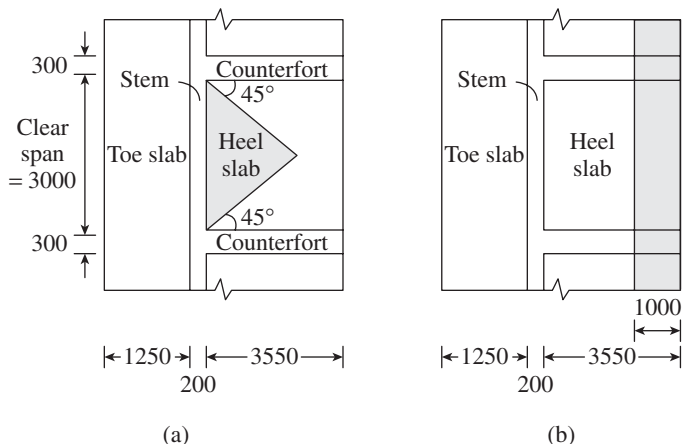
Assumed behaviour of heel slab (a) Cantilever action (b) Continuous beam action
